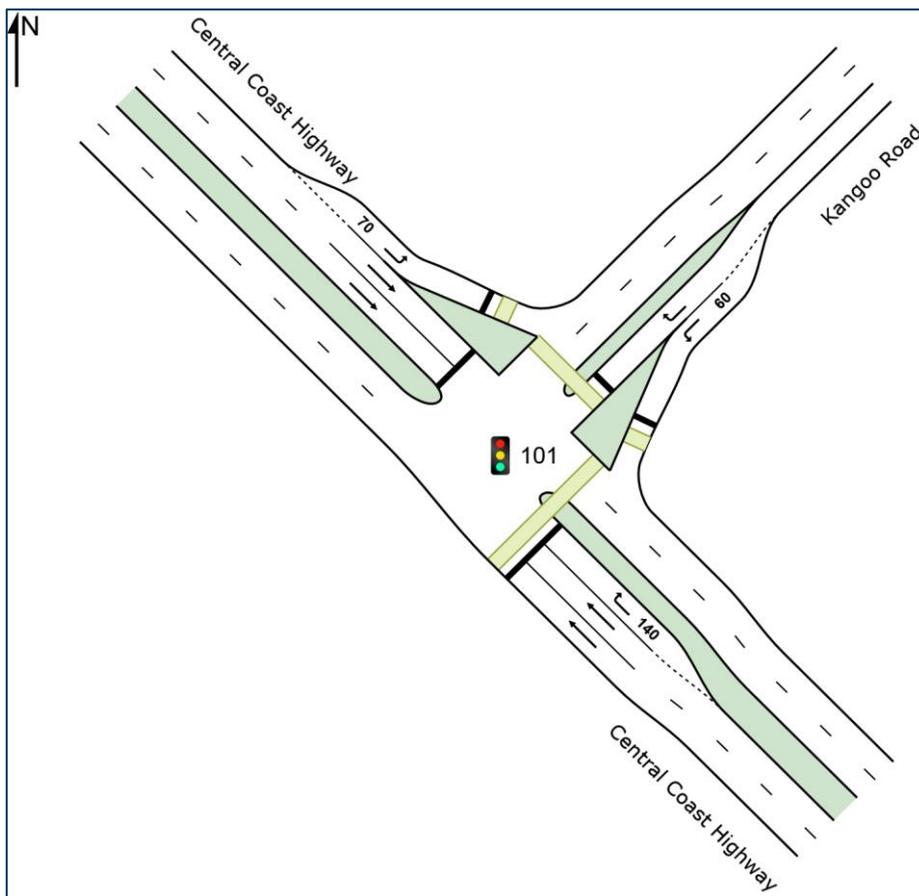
Kangaroo Road / Central Coast Highway SIDRA layout
